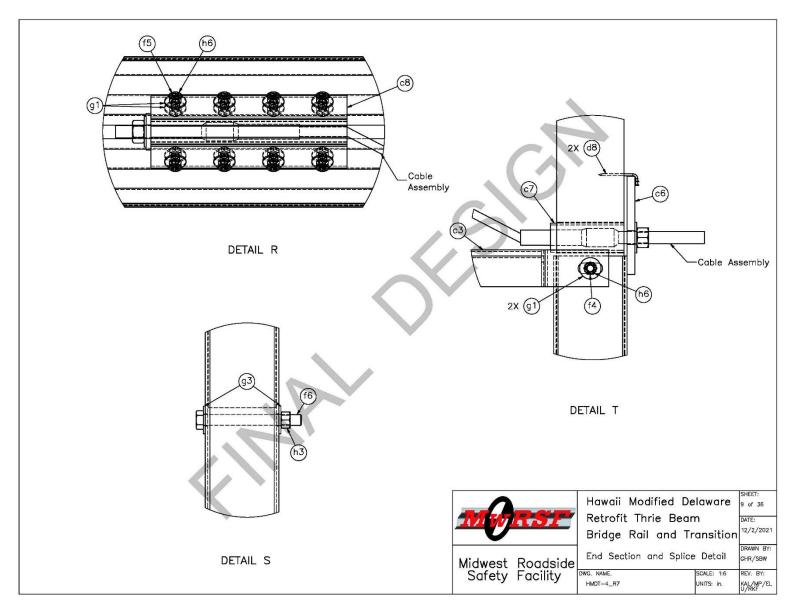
End Section and Splice Detail, Test No. HMDT-4
